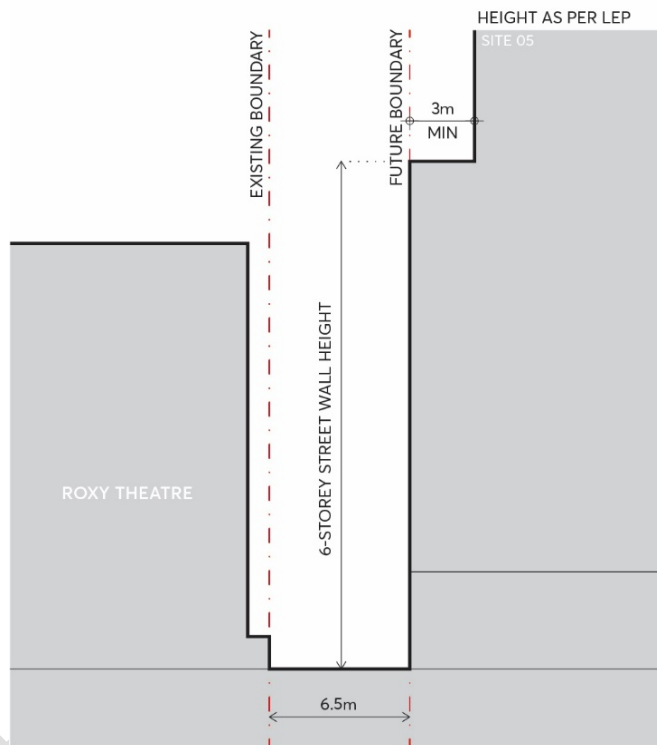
New Laneway between the Roxy and Site 05 (Section F)
